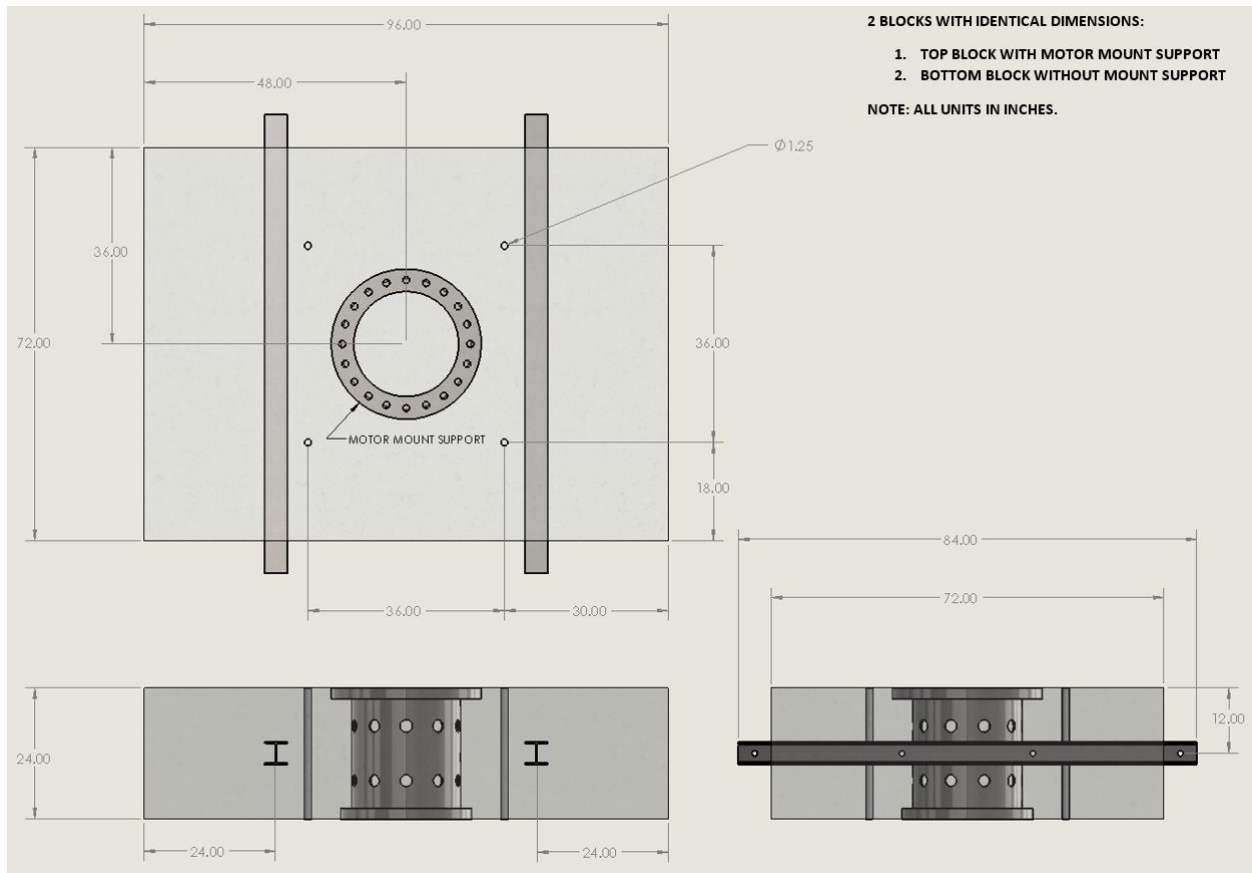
Engineering drawings for modular Surface Orbital Vibrator (SOV) concrete foundation.
